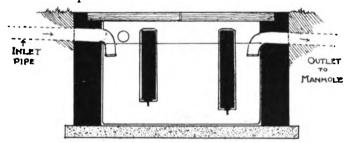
Cold water grease trap in brickwork or concrete. (Longitudinal section.)
